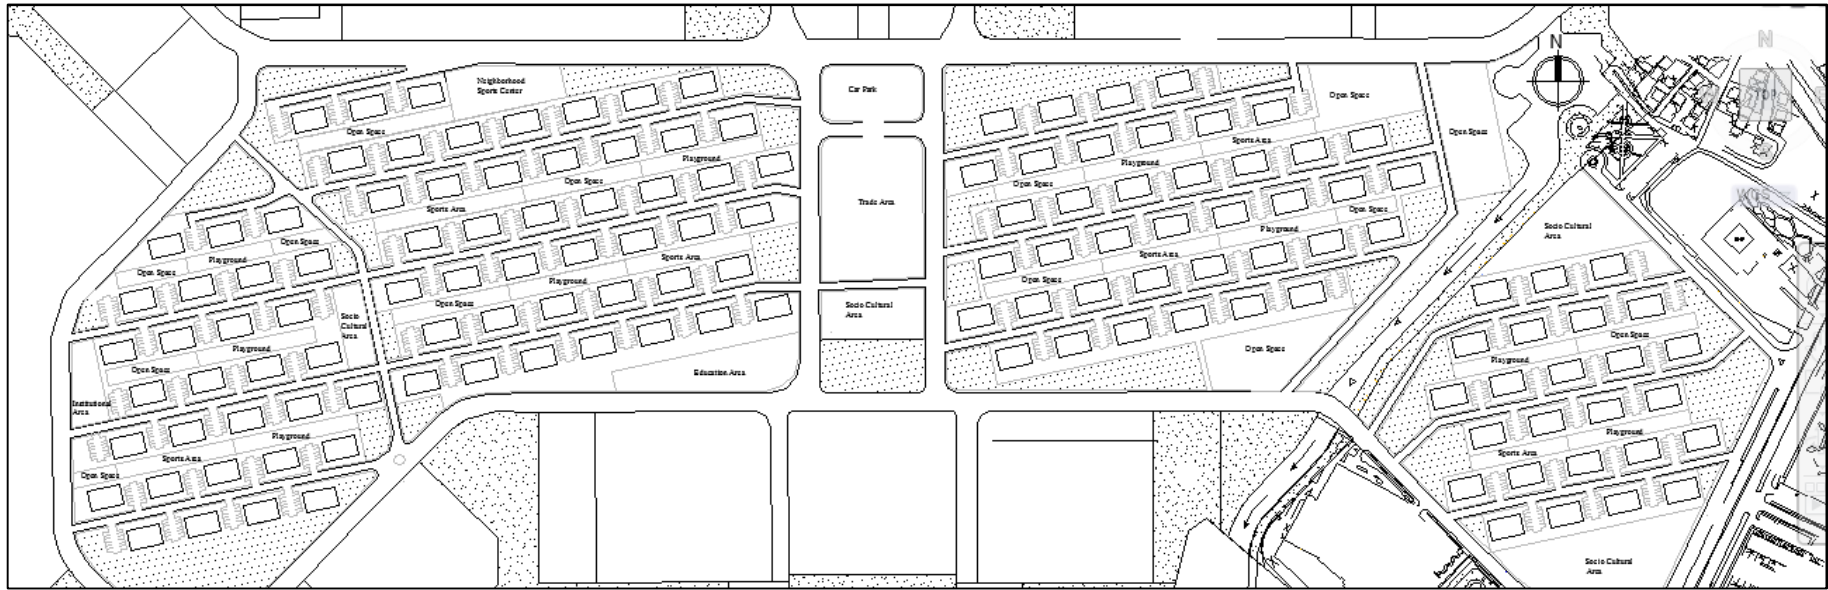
Site plan of four-storey buildings alternative (Alternative A).
